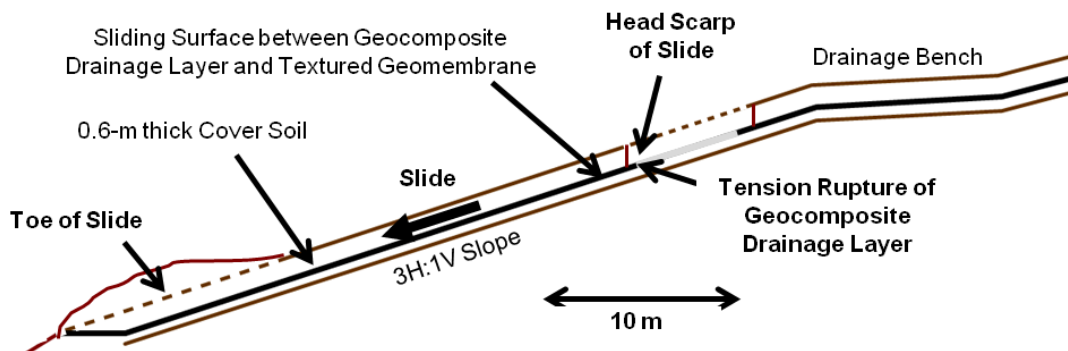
Cross-section through failure of a landfill cover slope during construction.
